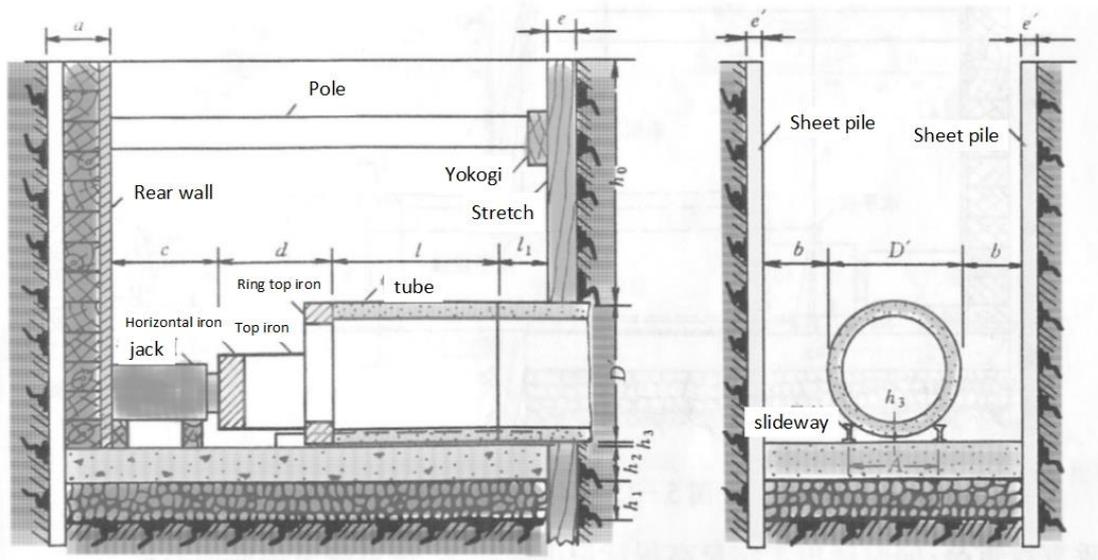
Schematic diagram of jacking construction structures and facilities
